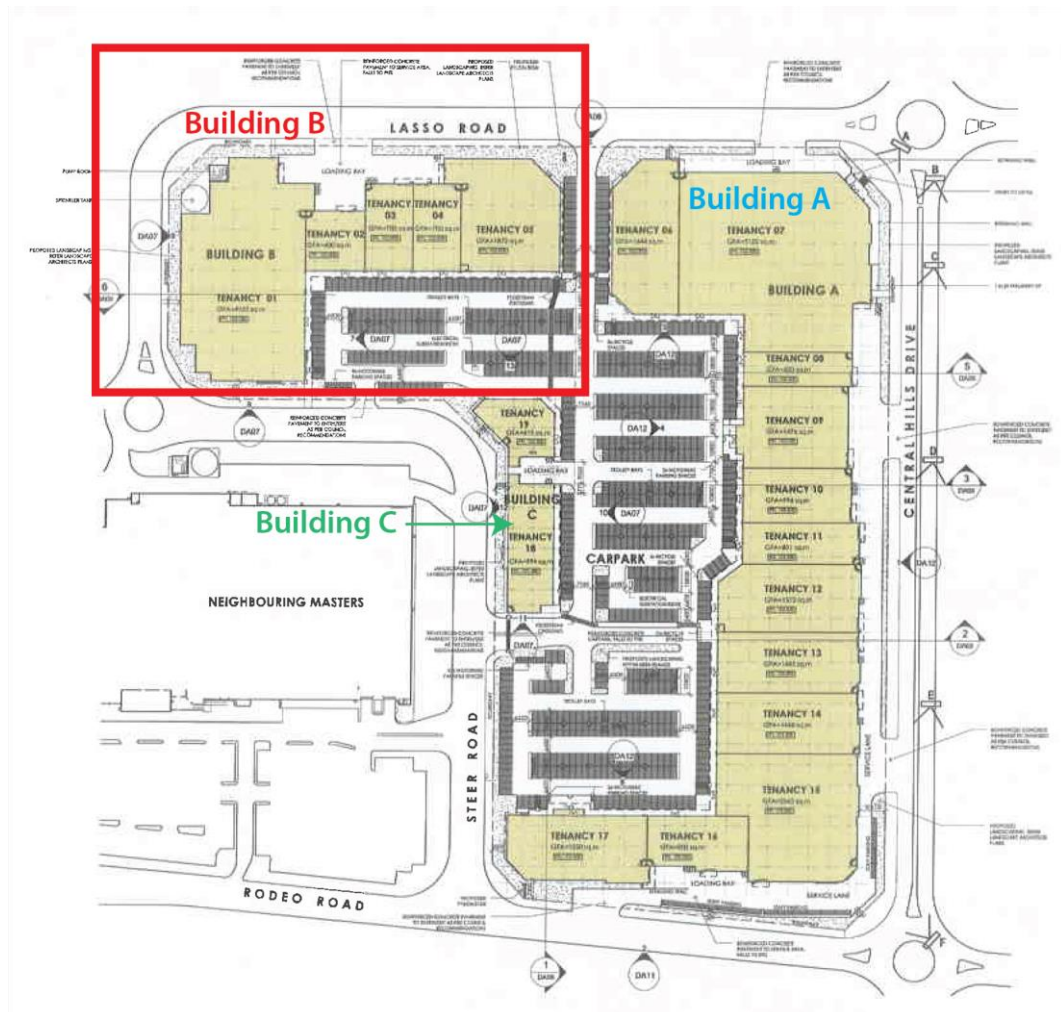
DA 752/2012 - Site Plan DWG DA01 By Leiffler Simes Architects – Altered to show location of previously approved 'Building B' and location of current proposal.
